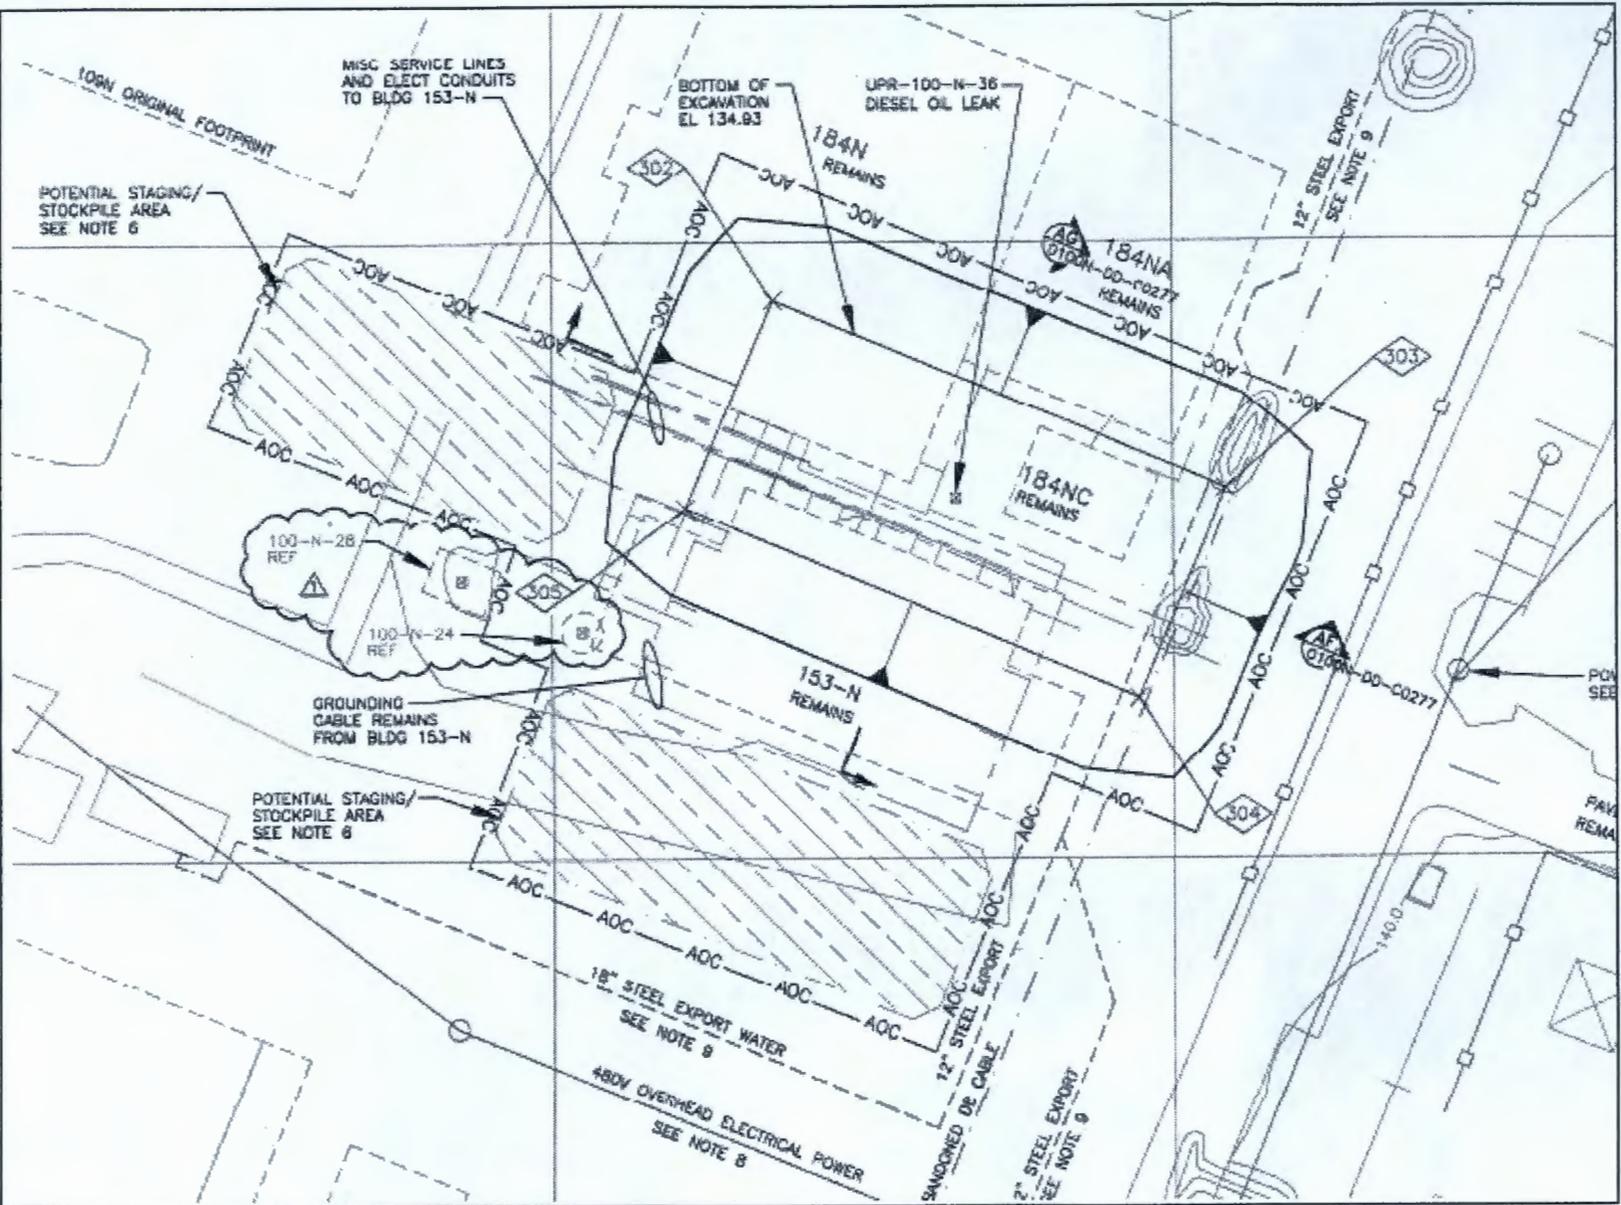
UPR-100-N-24 Waste Site Excavation Civil Plot (drawing: 0100N-DD-C0254)
